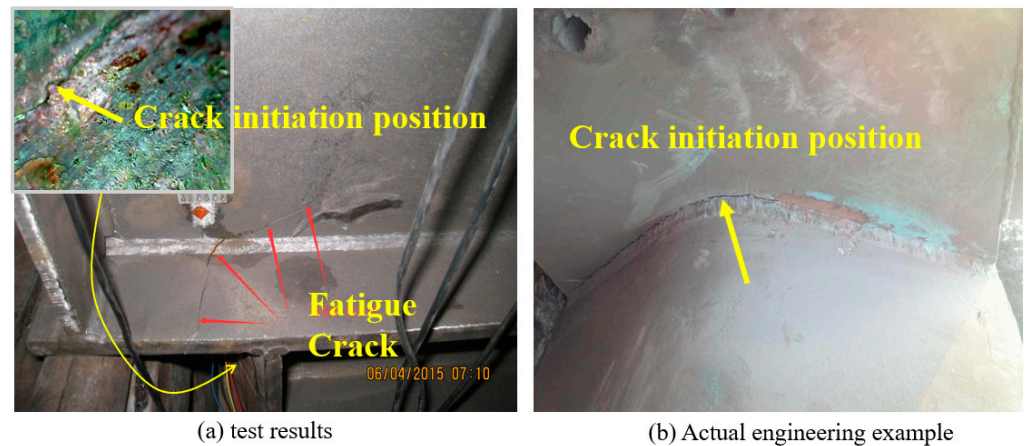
Cracks originated at the weld toe on the plug-in plate.
